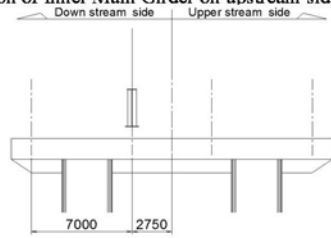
Approach Bridge (Steel Girder)/Assembly Procedure Drawing (2)
